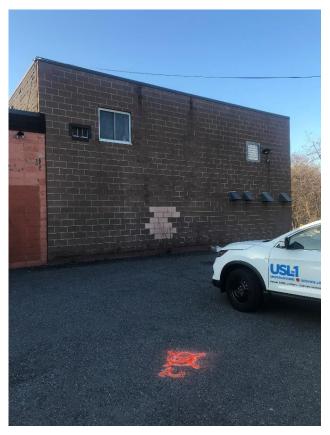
Northeast face of Site building, facing southwest (April 6, 2021).
